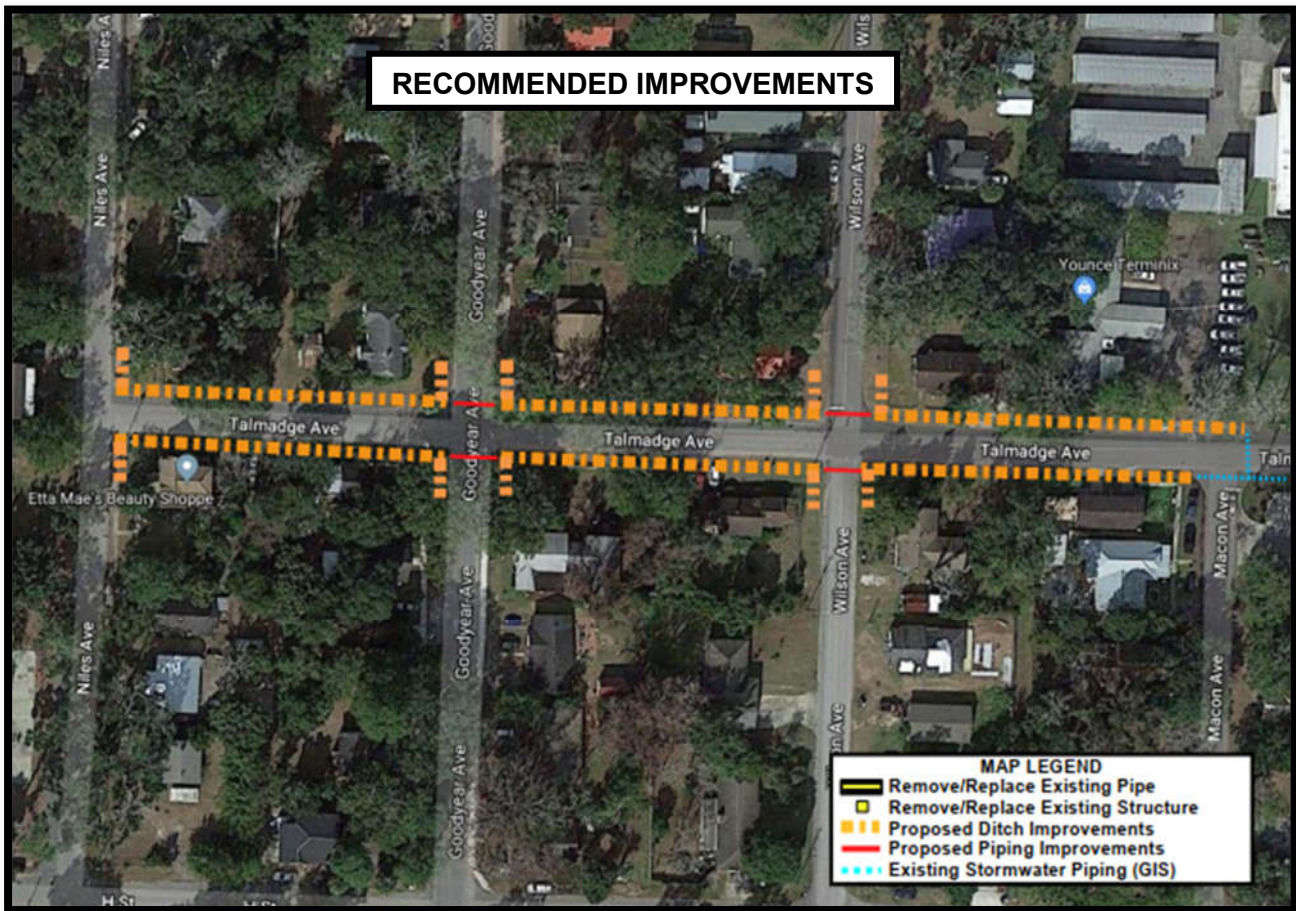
Talmadge Avenue Ditches Potential "In-House" Project
